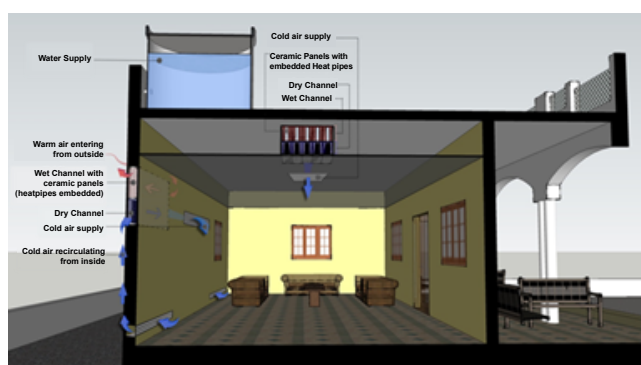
Ceramic panels cooling: Roof and wall cooling systems.
